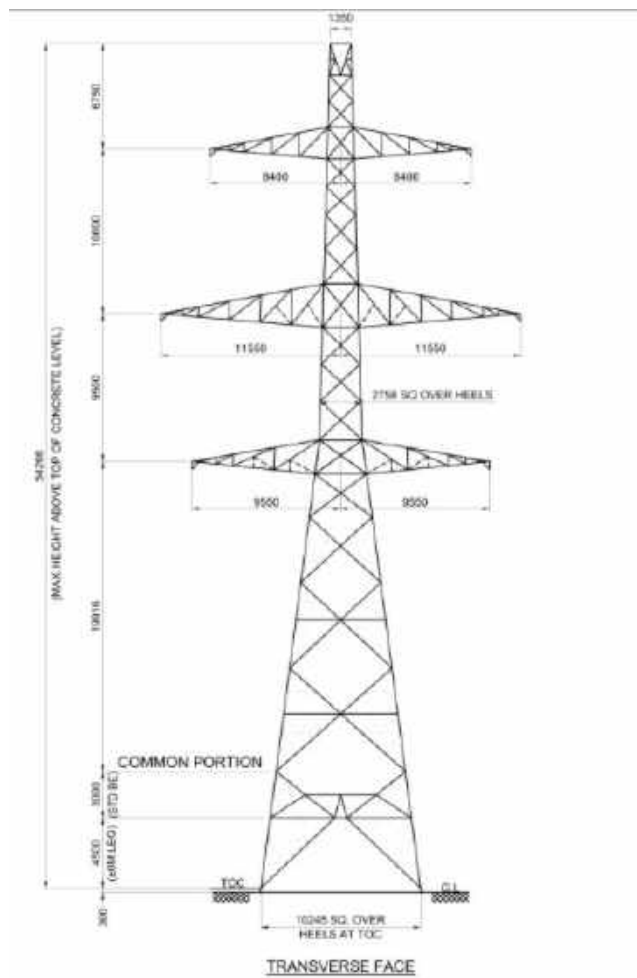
Proposed ASTI SSE400 Steel Lattice Tower Typical Schematic
